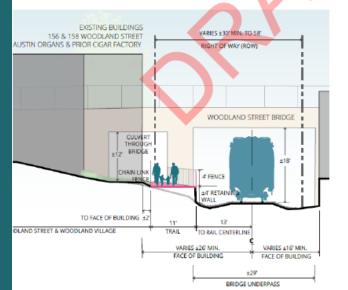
Cross Section excerpt of the Southwest Alternative, Location 4 (at Woodland Street). See the Appendix for all cross sections.
